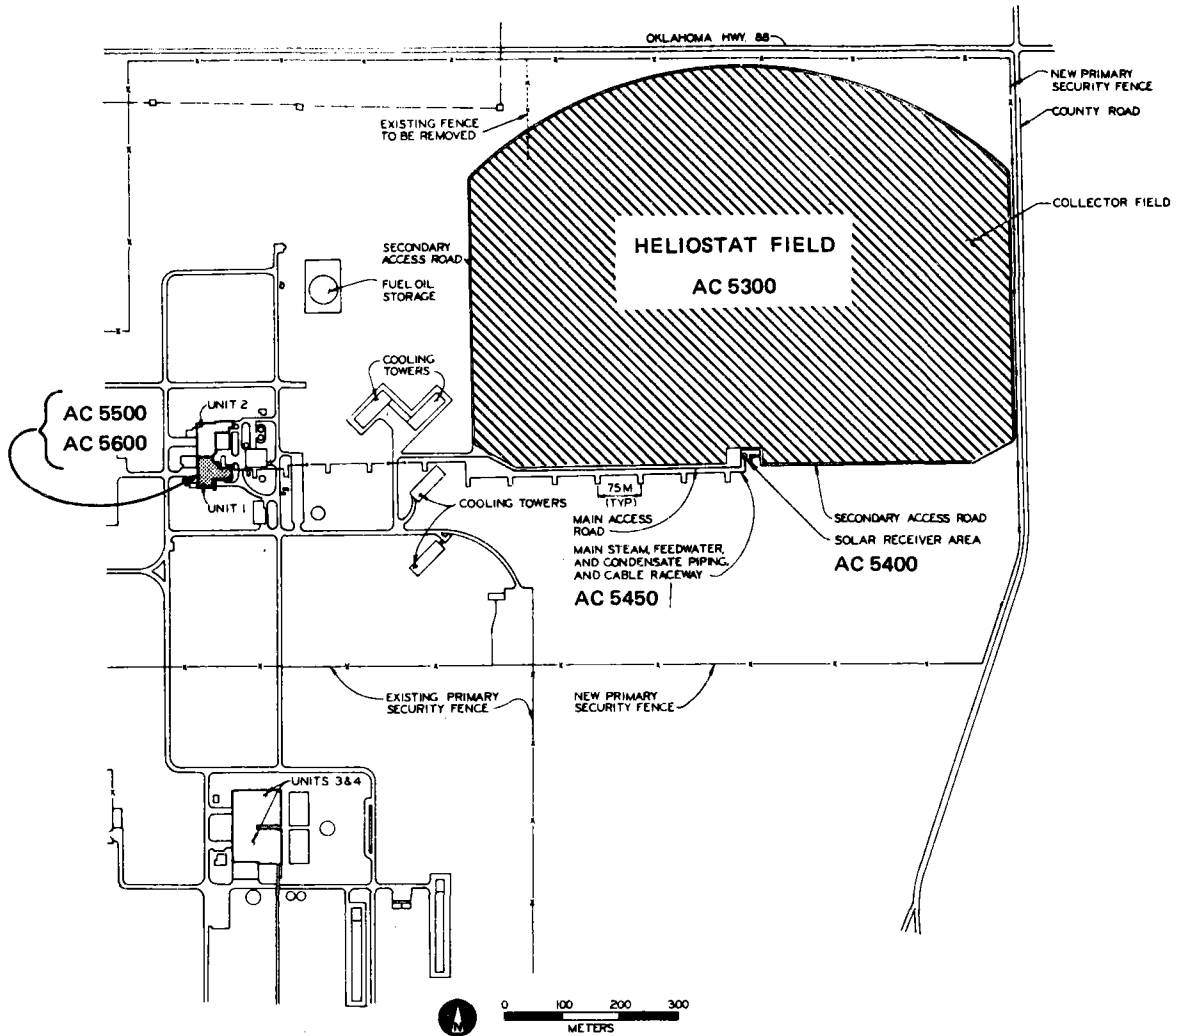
II. SITE ARRANGEMENT OF REPOWERED PLANT SHOWING COST ACCOUNT BOUNDARIES
